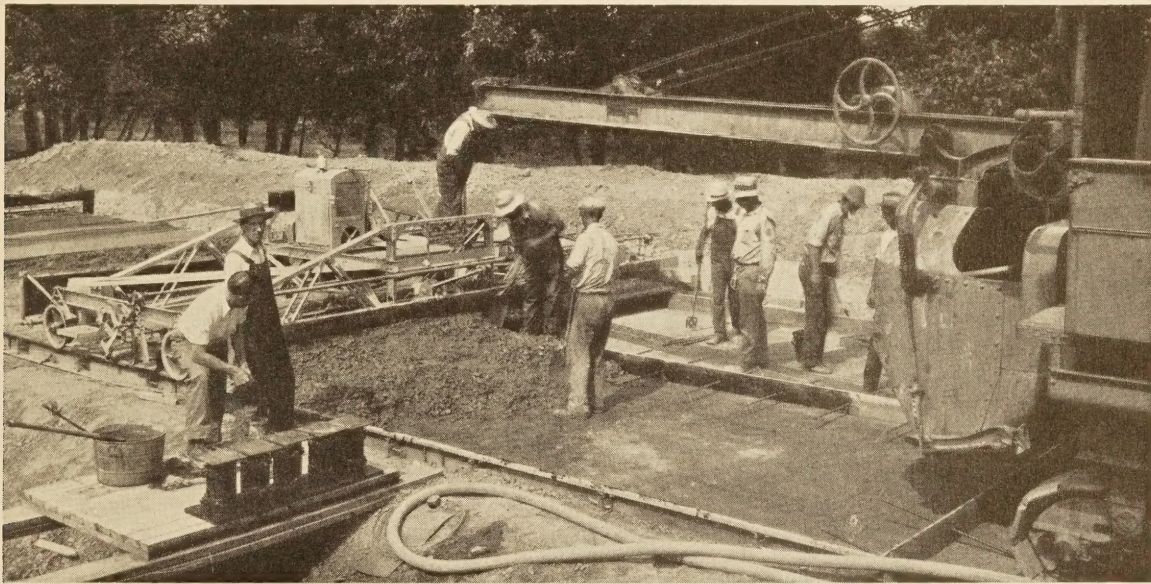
THE MIXING AND PLACING OF THE CONCRETE.
